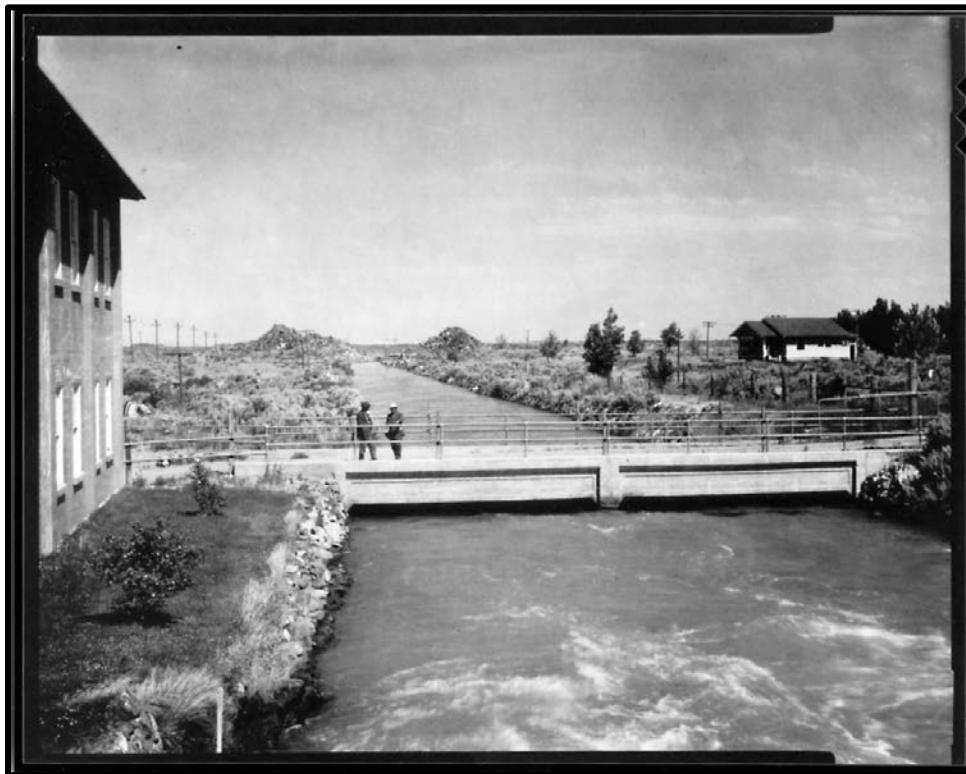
Bridge over North Side Canal at Dam Complex, 1918. HAER No. ID-16-129
